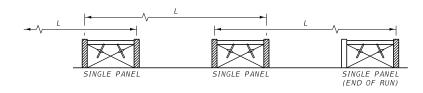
DETAILED DRAWING REFERENCE DWG. NO. STANDARD SPEC. SECTION 607 607-05
